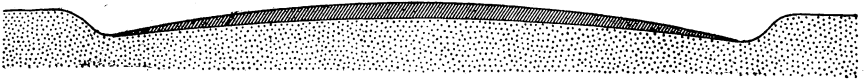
Cross section of road, showing clay cover on "deep" sand subsoil.
